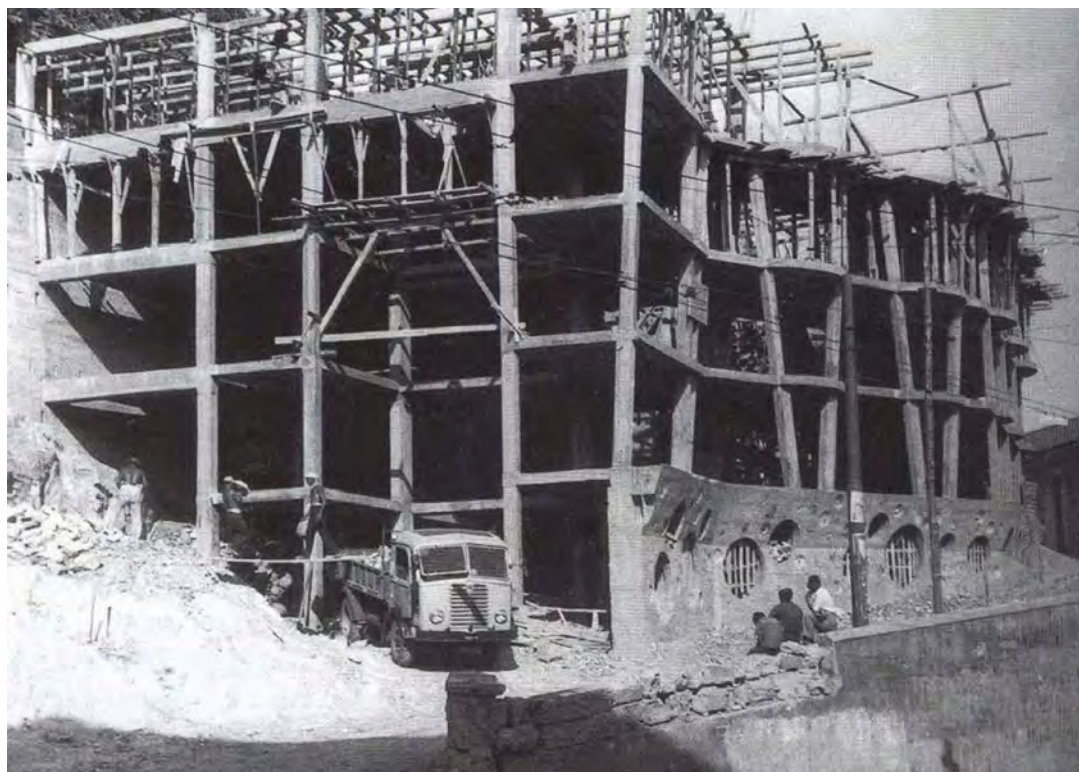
Building construction (Photo by Ayano Atsumi).
